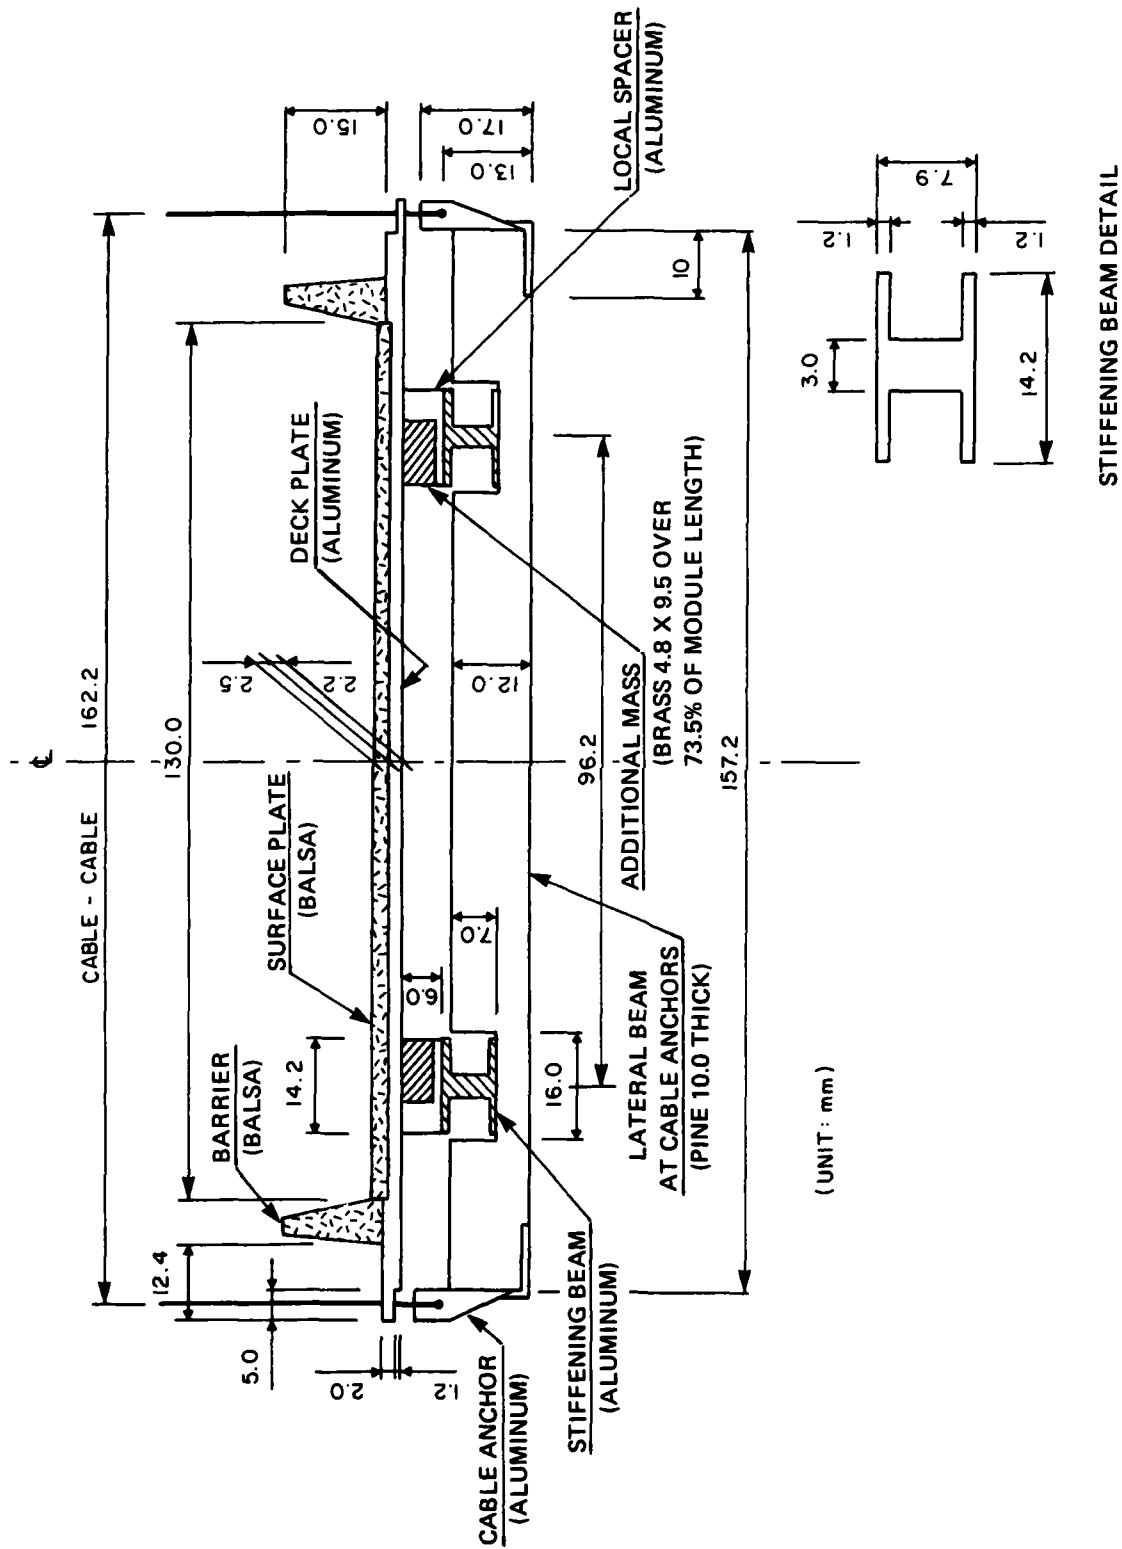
BRIDGE DECK AND FLOOR SYSTEM WITH CABLES
